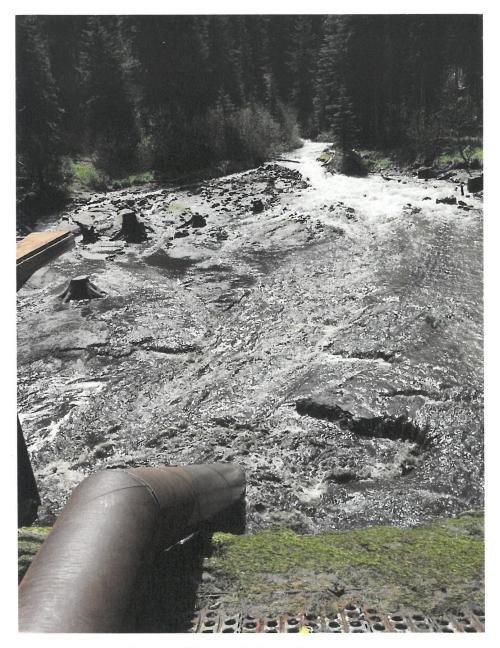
20-inch siphon in Wallowa Falls Forebay
